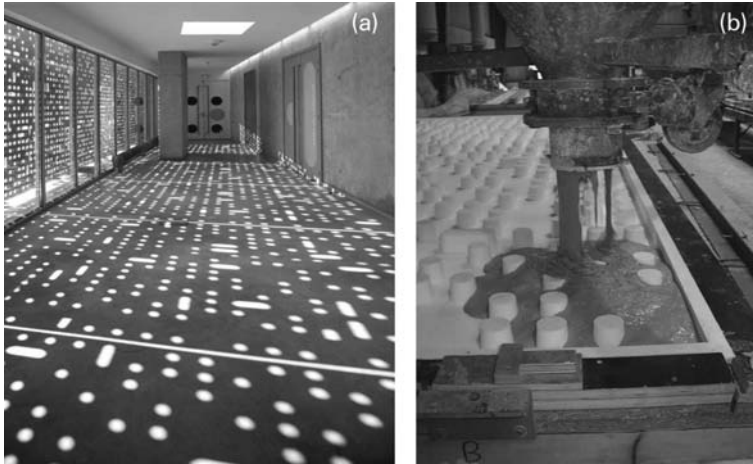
Façade to a building in Sedan, France: a) daylight passing through the perforated UHPC façade panels, b) concreting the panels
